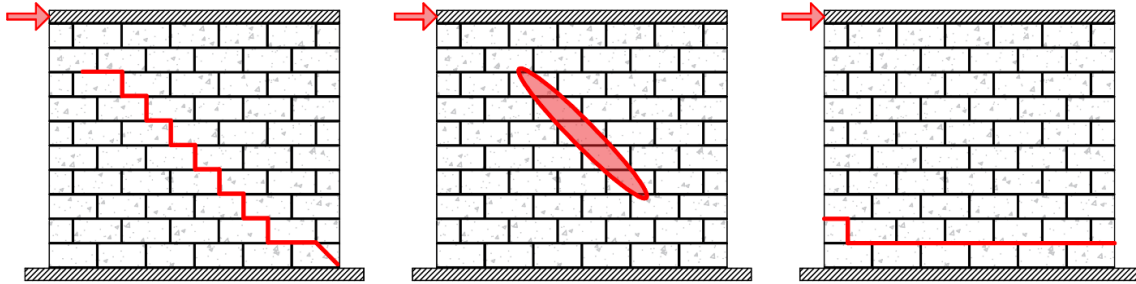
Shear Failure (a) Diagonal Tension (b) Compressive Strut (c) Sliding
